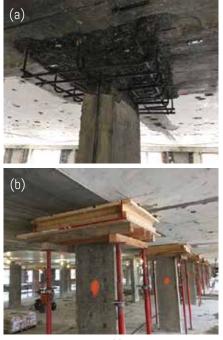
Shear capital repair: (a) preparing and reinforcing the concrete surface, and (b) installed formwork prior to concrete pumping
